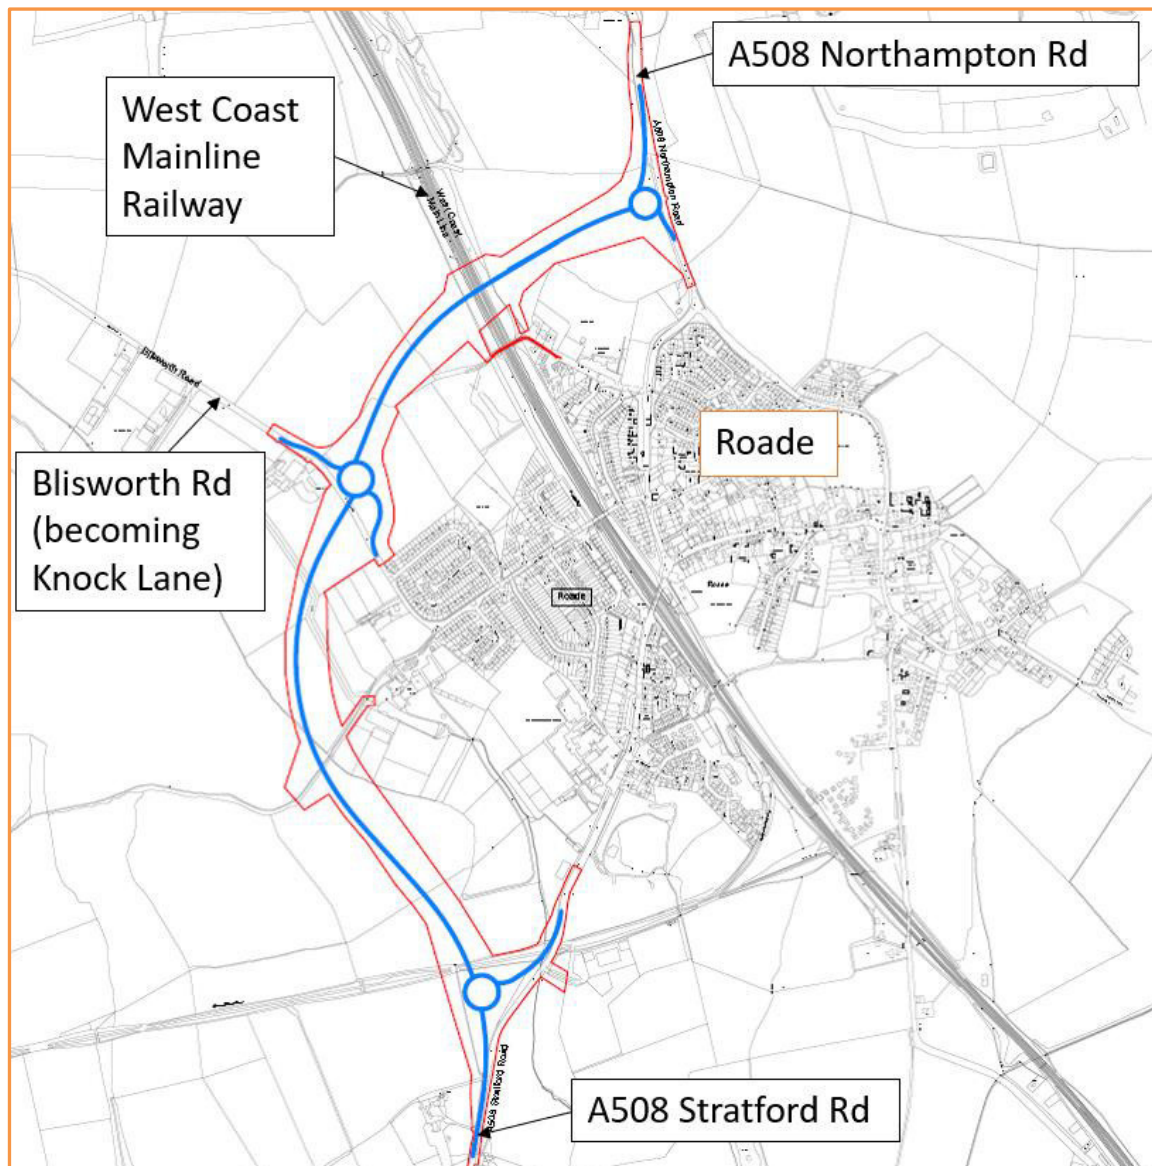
Preferred A508 Road Bypass alignment (extract of drawing NGW-BWB-GEN-XX-SK-C-SK05-S2-P2 provided at Appendix C of the Road Bypass Options Report)
